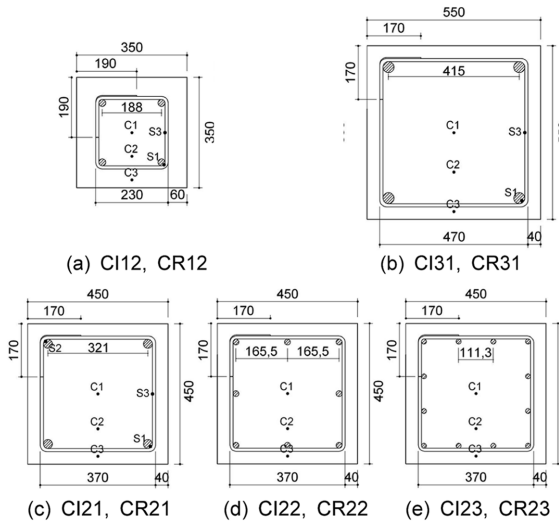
Cross sections and locations of thermocouples (unit: mm)
